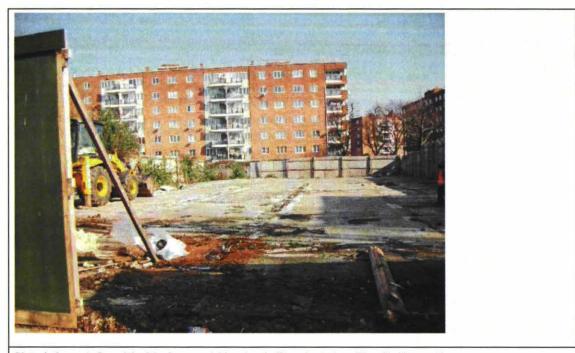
Concrete floor slab of the former neighbourhood office prior to demolition (looking west)
